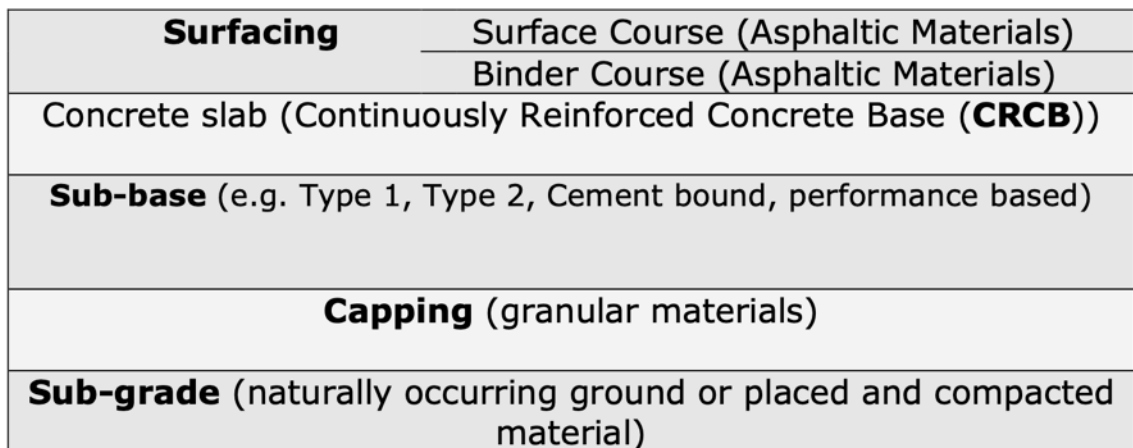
Cross-section of CRCB rigid pavement (Source: Ali, 2016)
